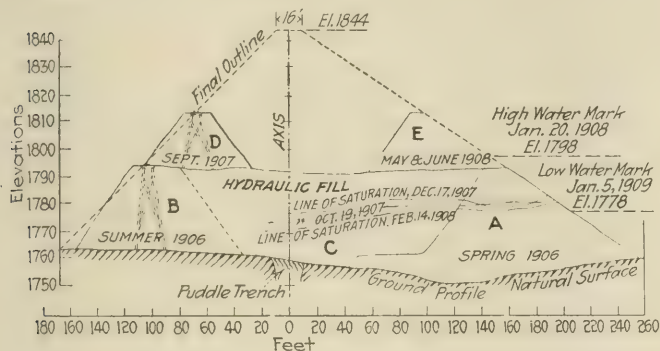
SECTION THROUGH LEWISTON-SWEETWATER LAVA DAM
